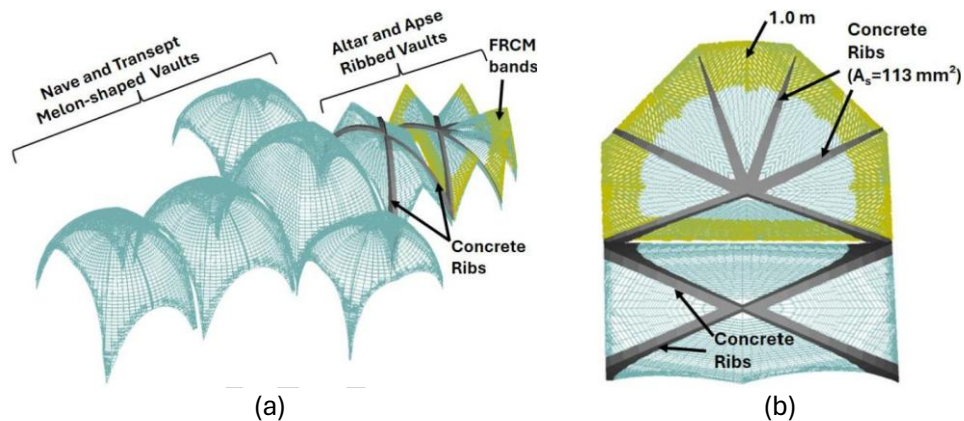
Details of the reinforcement of the vaults: (a) general 3D view and (b) plan view of the vaults reinforced for Church 3
